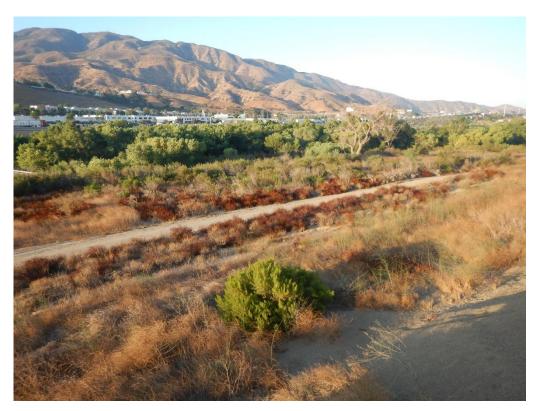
View of existing cart path and Alternative 2 alignment located to the west of the Santa Ana River, facing north.
